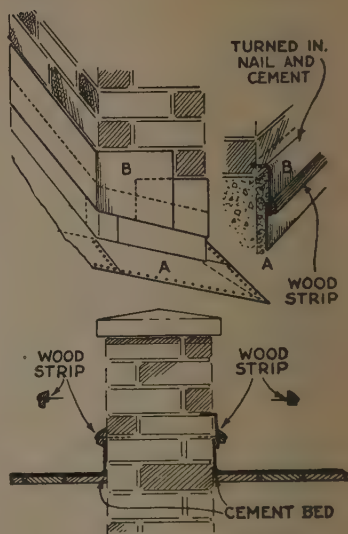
How flashing is applied around a chimney and a parapet wall in repairing tin roofs.
